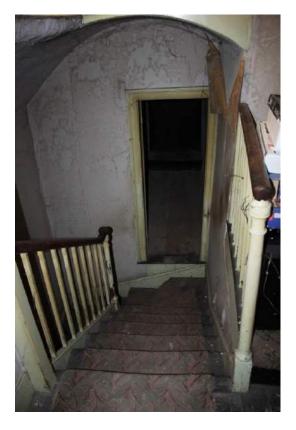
Looking east down upper flight of stairs towards doorway into Bock 2 off staircase
